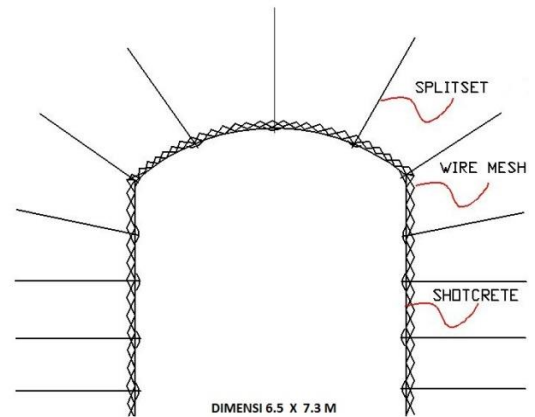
Supporting type 2 RMR 41-60 headrace tunnel
